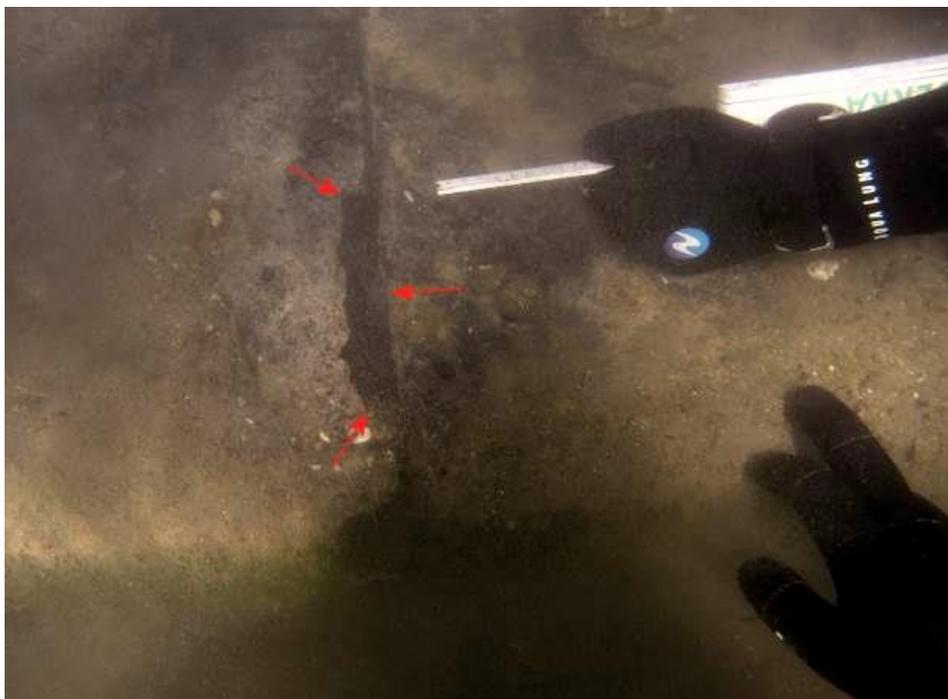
Complex cracks in a concrete wall. Detailed documentation is only possible in-situ and should be carried out by qualified engineers.
